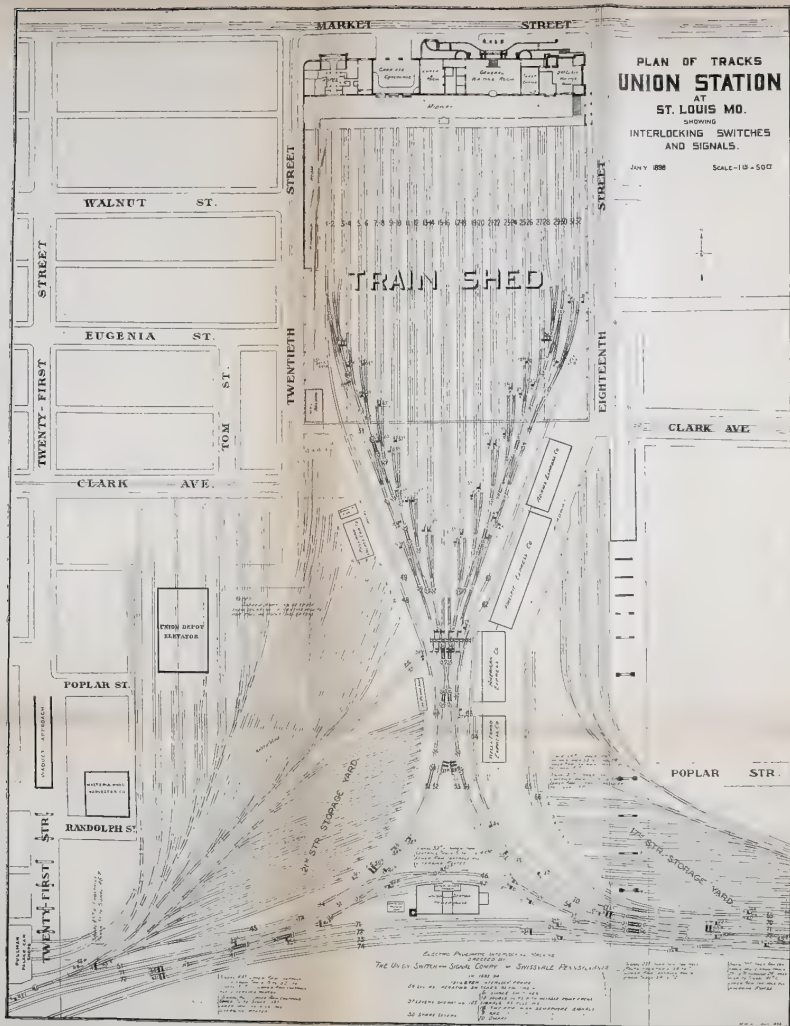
ORIGINAL PLAN OF TRACKS, UNION STATION.
